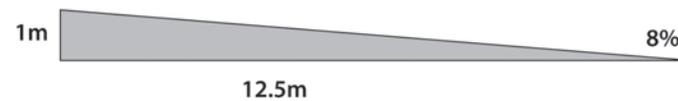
The recommended maximum road slope of 8% is illustrated above. A road with an 8% slope will rise vertically by 1 metre for every 12.5 metres of horizontal distance.
